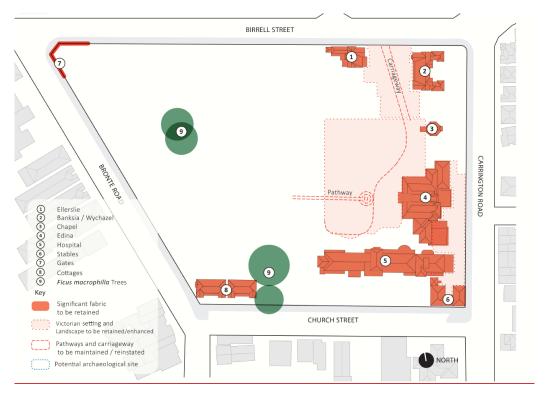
Site Plan identifying significant fabric and spaces to be retained
